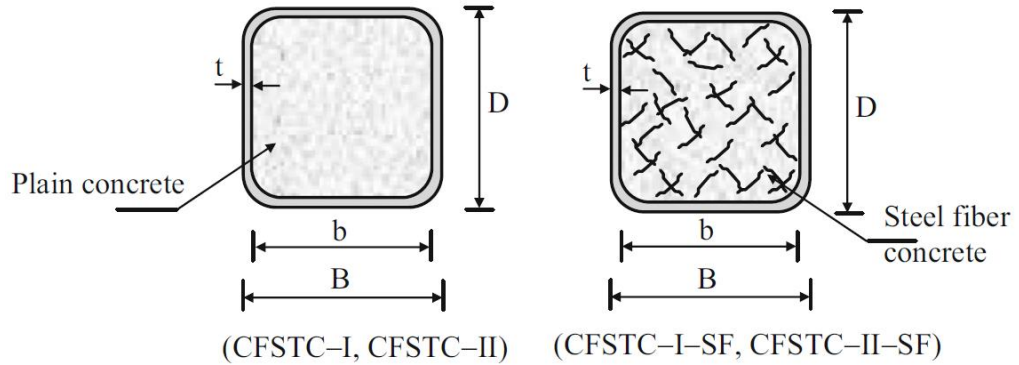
Cross Sectional Details of CFST Column Specimens with Plain Concrete and Steel Fiber, Serkan Tokgoz & Cengiz Dunder [2010]
